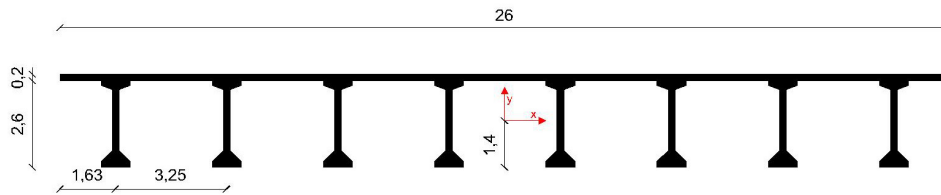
The cross section of simply-supported decks (dimensions are in meters)
